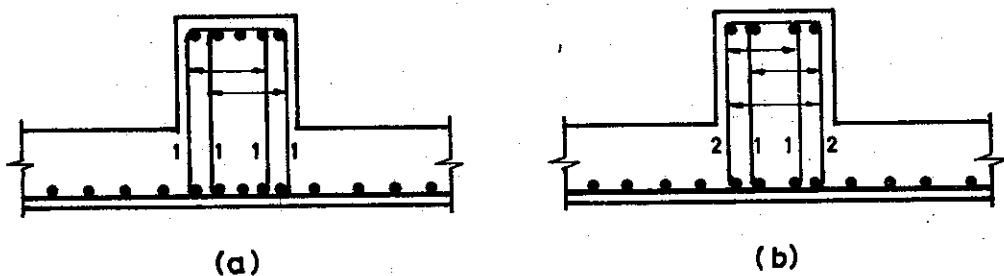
Multilegged stirrups: (a) Four-legged stirrups; (b) Six-legged stirrups.
